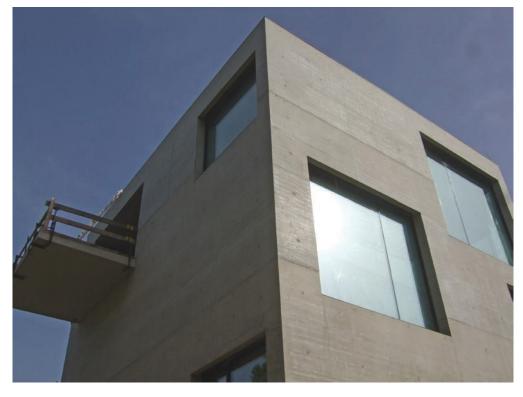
Alignment and tightness of joints at corners and windows is critical in architectural concrete (Photo courtesy MEVA Formwork Systems)
